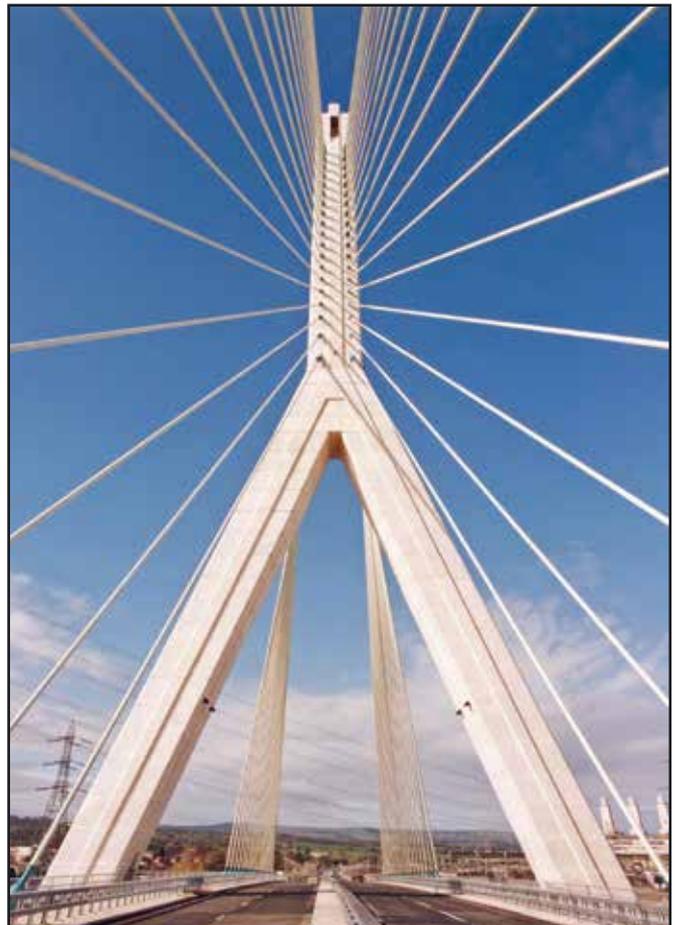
Flintshire Bridge - controlled permeability formwork towers.
